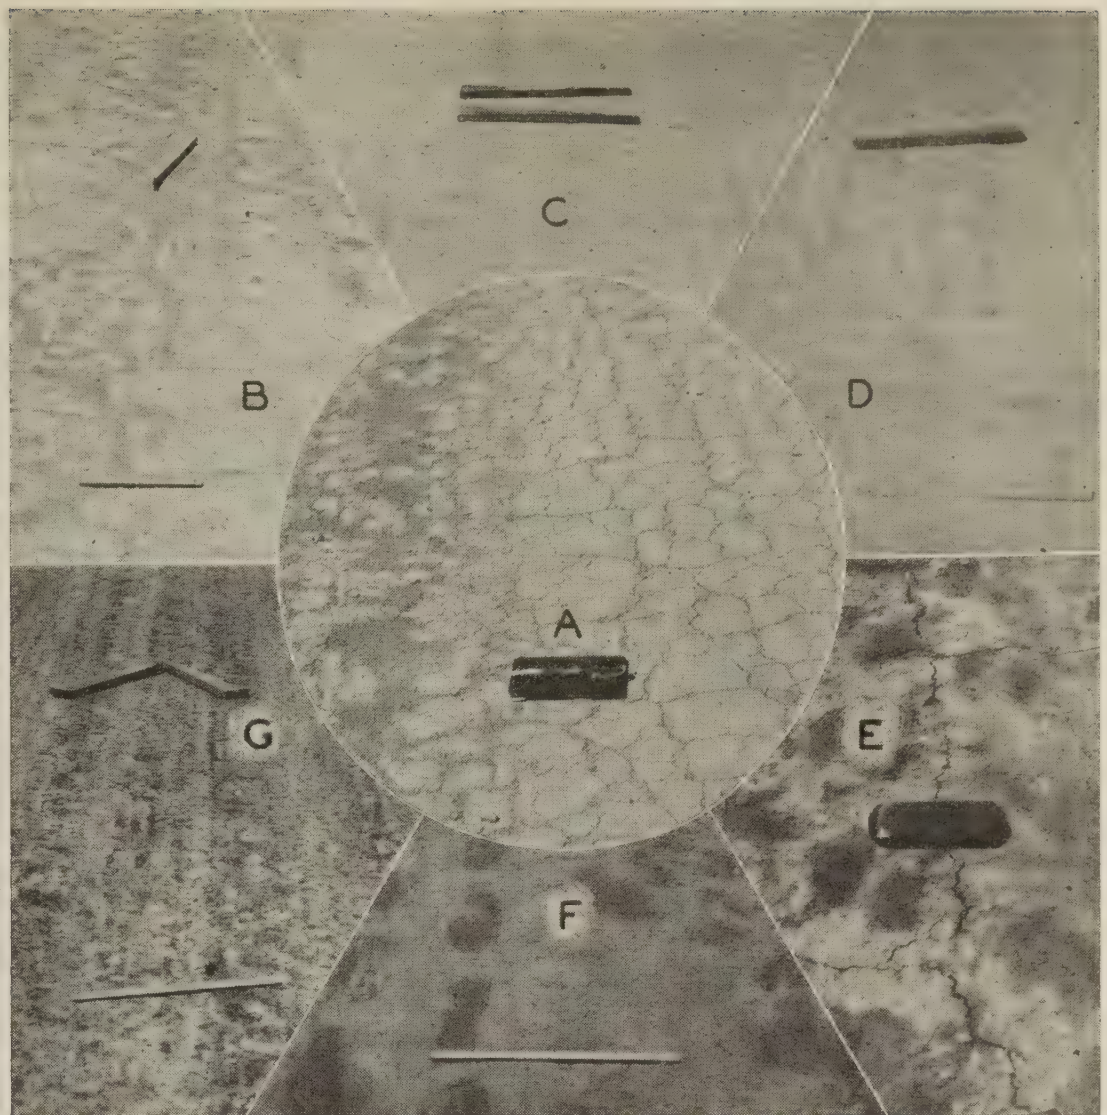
(A) Shrinkage cracks in the roadbed soil prior to construction. (B) Appearance of the completed soil-cement base course on section 17 (3 percent cement); (C) on section 22 (7 percent cement); (D) on section 19 (7 percent cement) after the top was enriched and reconstructed; (E) on section 1 (7 percent cement) before reconstruction; (F) on the same section after reconstruction; and (G) on a section cured with emulsified asphalt.
